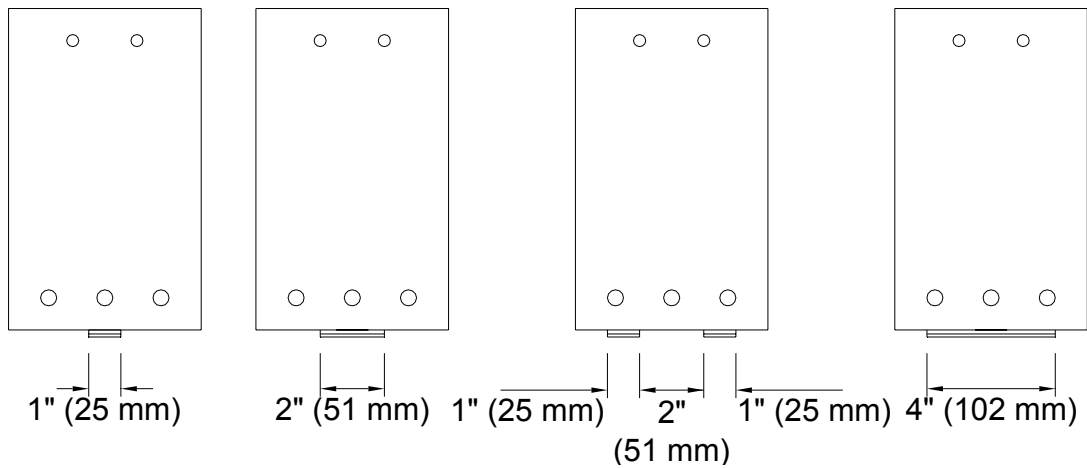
Detail of centered CFRP strips (a uniform adhesive layer approximately 1/16" (1.6 mm) thick was used in each case to adhere the CFRP).
